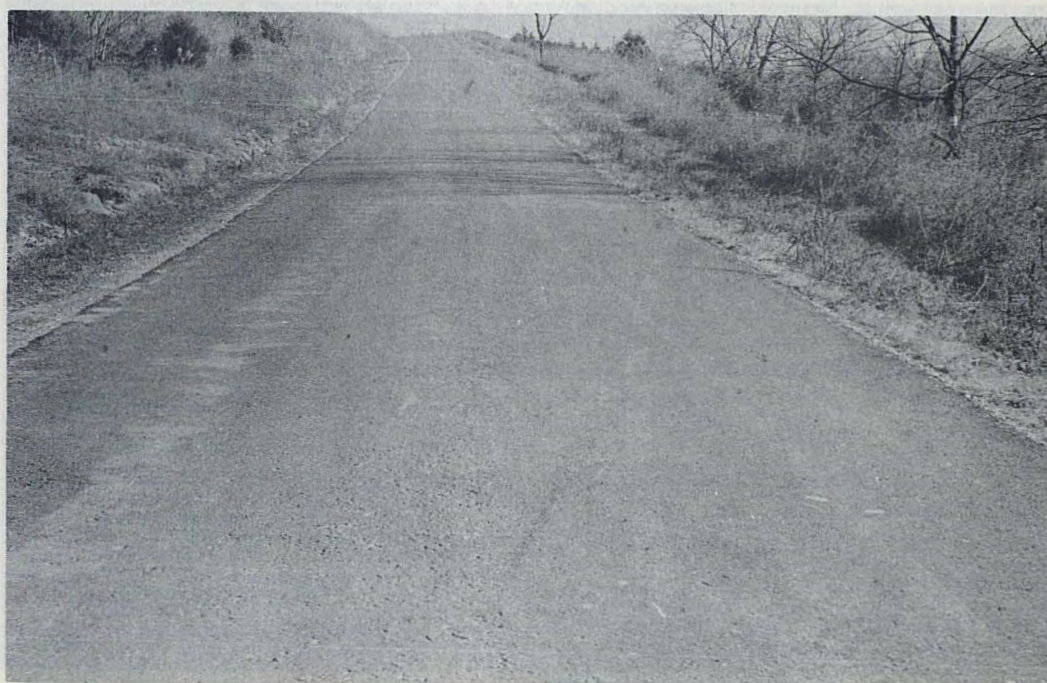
Portion of Owen Co. Projects where Only One Paver was used, Showing Cold Center Joint.
